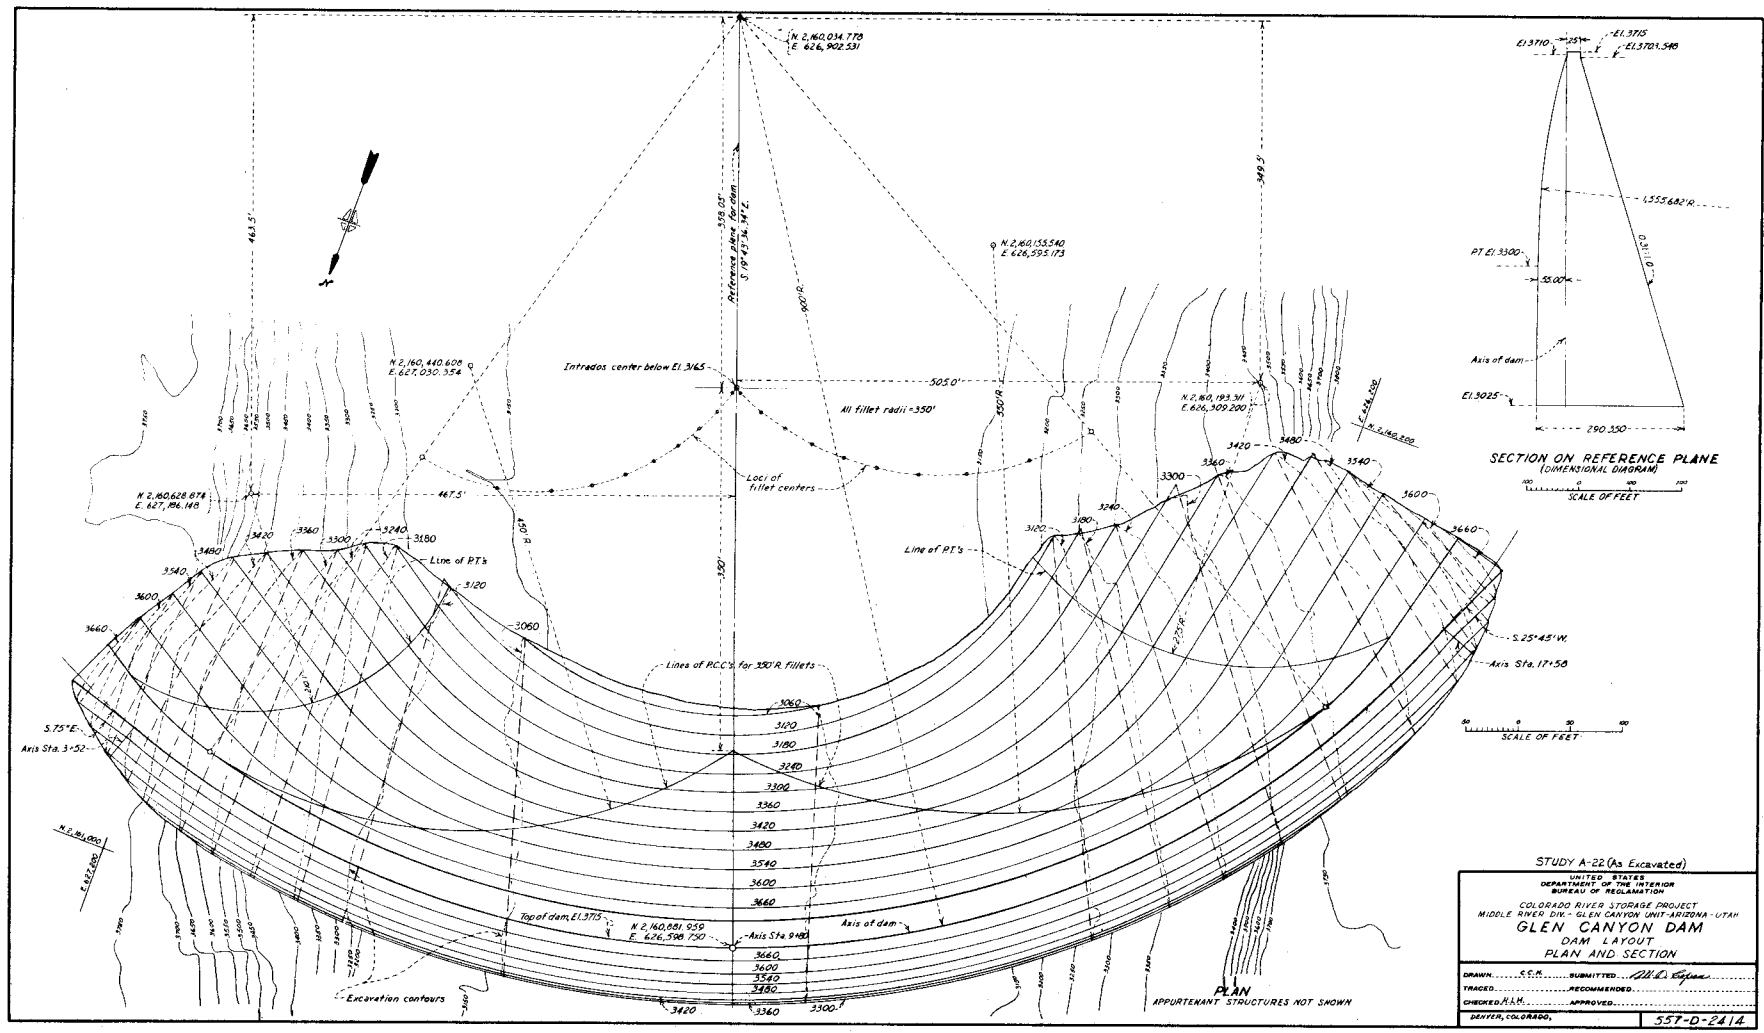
Dam study A-22 (final)—Layout, plan, and section.
